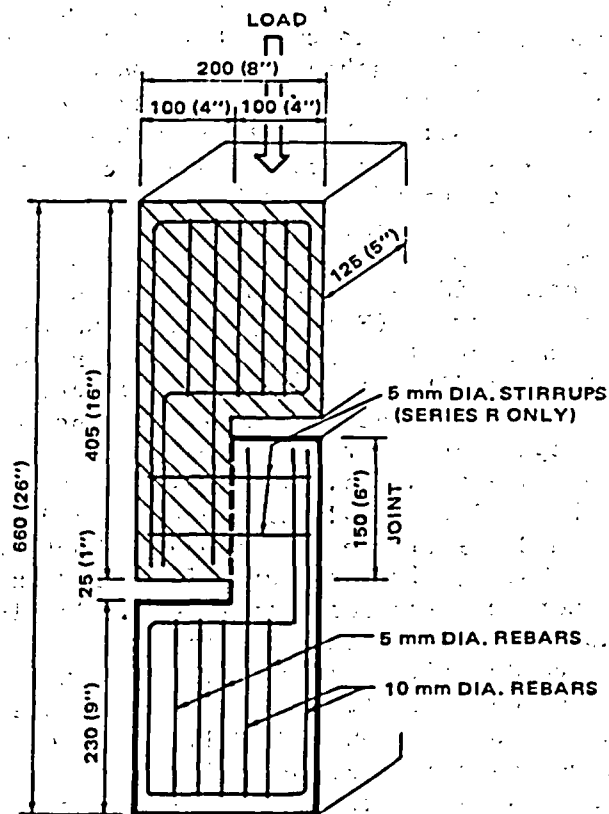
Details of concrete pushoff test specimens. Source: H. W. Chung and L. M. Lui, "Epoxy-Repaired Concrete Joints," *Proc. J. Am. Concr. Inst.* 74(6) (June 1977).
